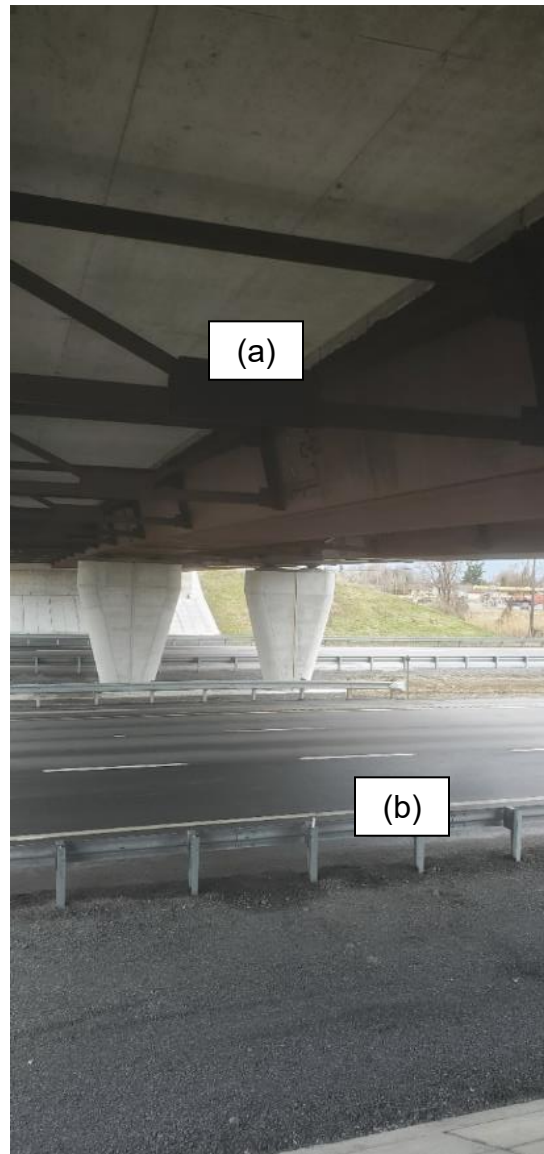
Perspective of the bridge's interior girders and the exterior steel beam guide rail. (a) The steel cross-frames between the box girders. These structural elements serve as the anchor points for the hot-dip galvanized mounting rails used to secure the experimental sensor panels. (b) The steel beam guide rail serves as a critical exposure site for the staggered WS mass-loss coupons; as these specimens are not mounted at height, they allow for straightforward seasonal retrieval. This accessibility facilitates a systematic evaluation of how discrete seasonal environmental variations influence the long-term corrosion kinetics of the weathering steel structure.
